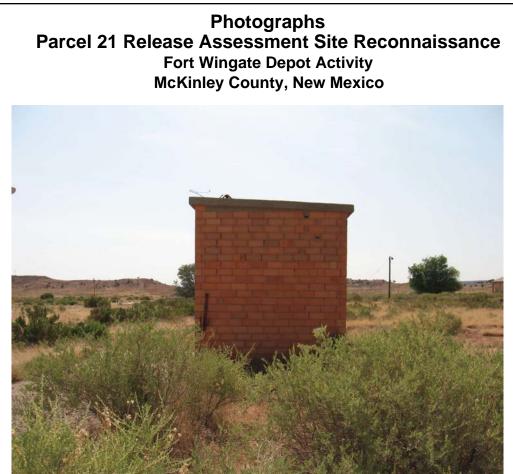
AOC 67, Building 513, looking east at exterior condition of building.
